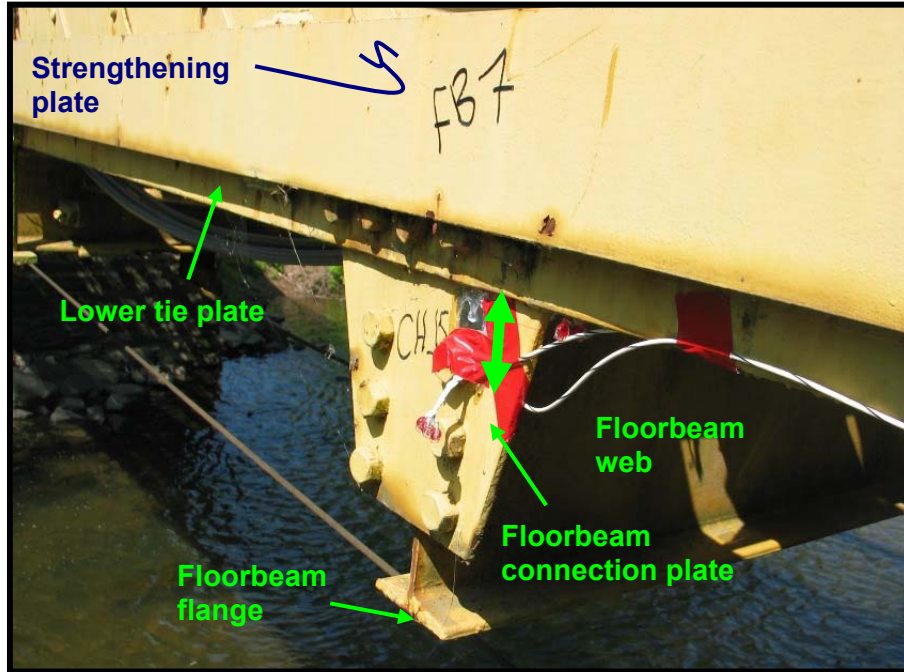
CH\_15 installed on the front face of the connection plate at floorbeam 7
